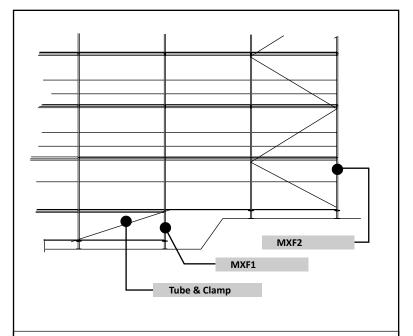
Bracing Base on Uneven Ground – Stepped Ground (Elevation View of Outside Frame Leg)
